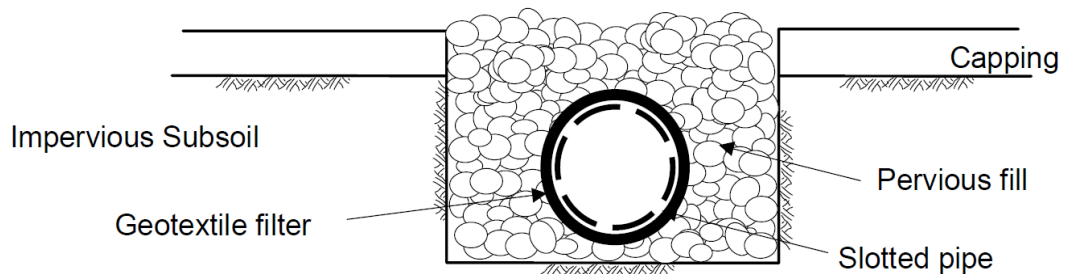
Cross-section of a subsoil drain where the pipe is wrapped in geotextile (alternative slotted pipe system)
